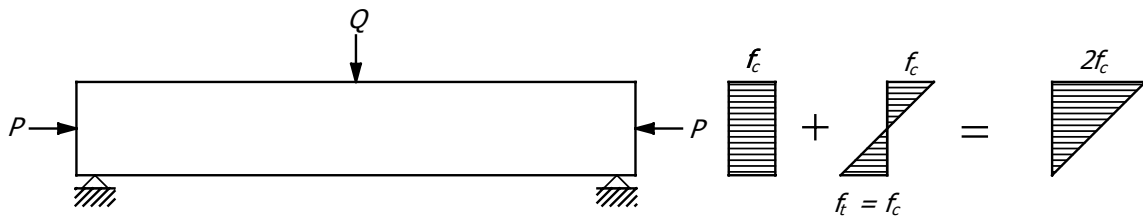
STRESSES IN RECTANGULAR PRESTRESSED CONCRETE BEAM
